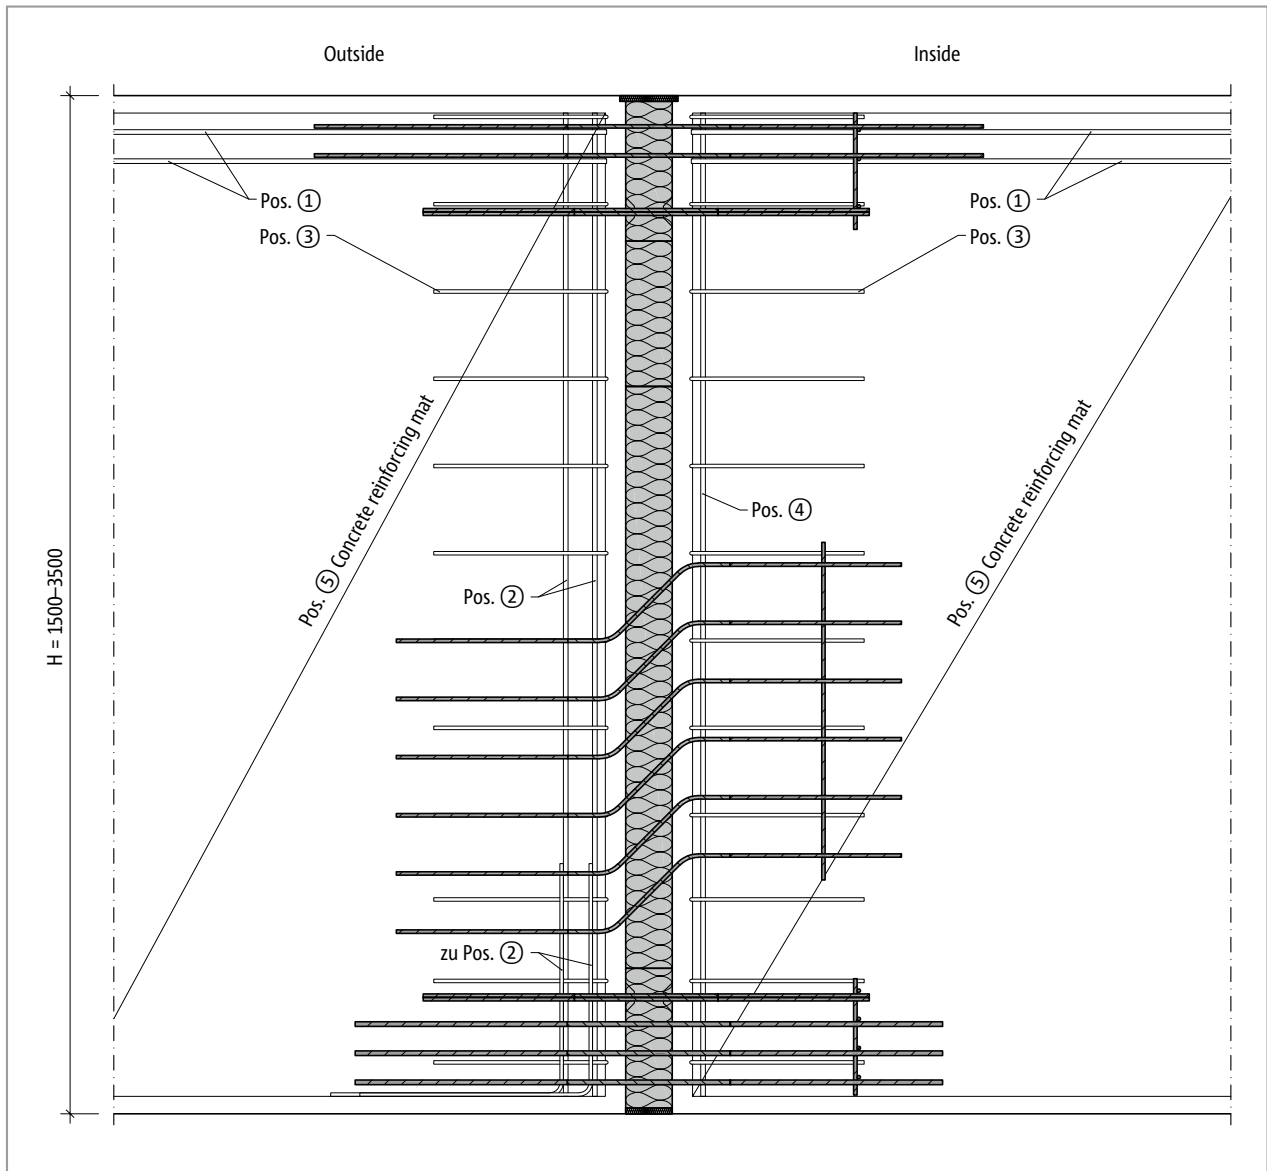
Schöck Isokorb® T type W: On-site reinforcement (cross-section)
